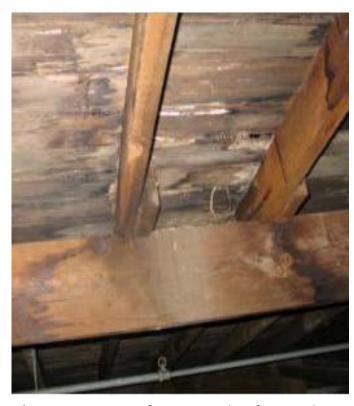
Deterioration of Existing Wood Roof Framing & Associated Roof Boards.
